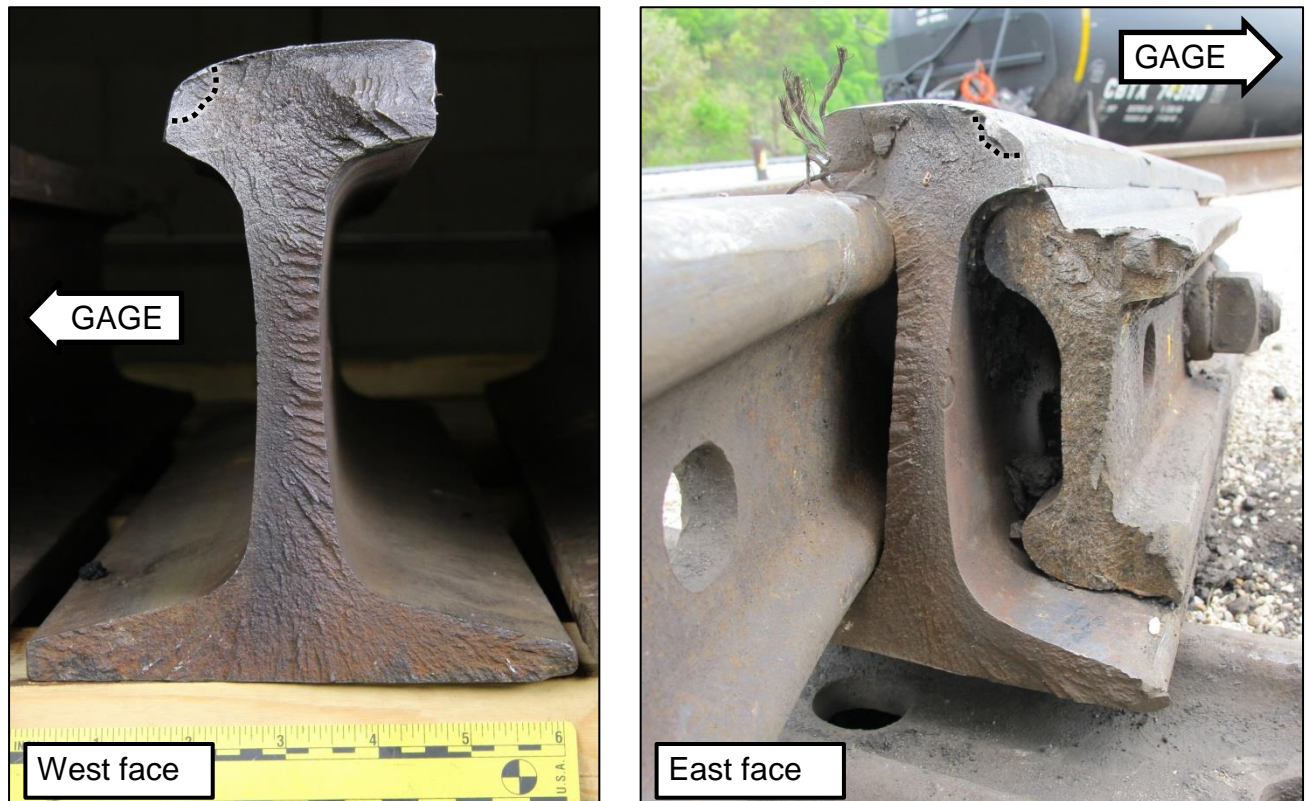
Overall views of the barred service failure. The south joint bar (on the gage side of the rail) was fractured, and bolts attaching the joint bars to piece 11N were missing. Dashed lines indicate the boundary of a detail fracture on the fracture surface.
